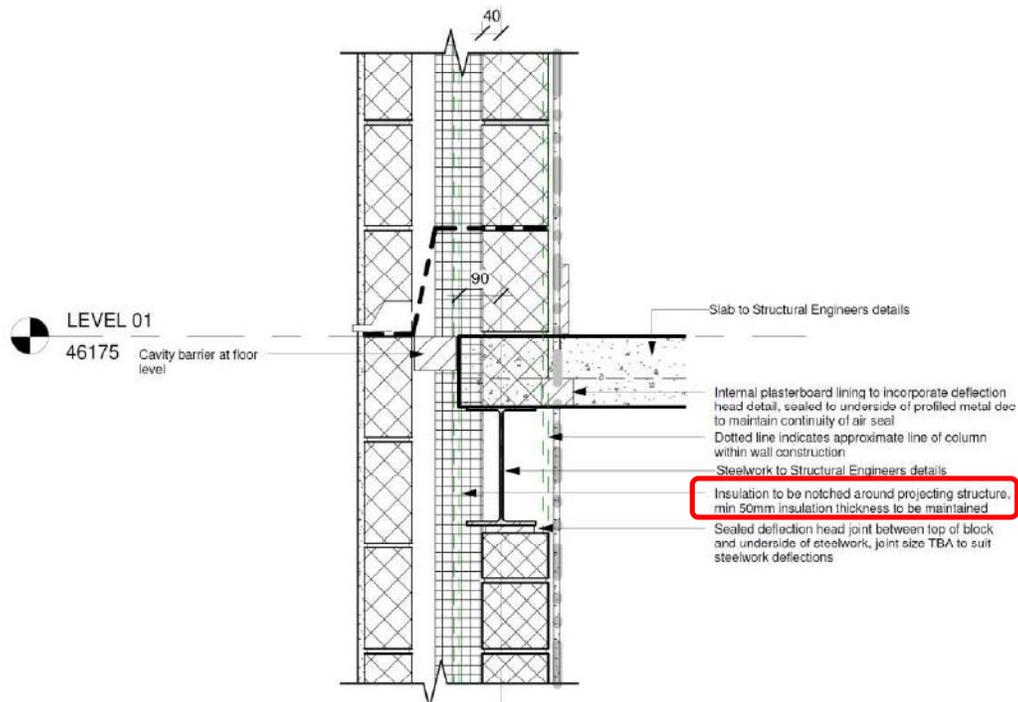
Typical external render wall/floor junction in Building B (Courtesy of AHR Global Architects): insulation thickness can be reduced to minimum 50 mm around the projecting structure.
